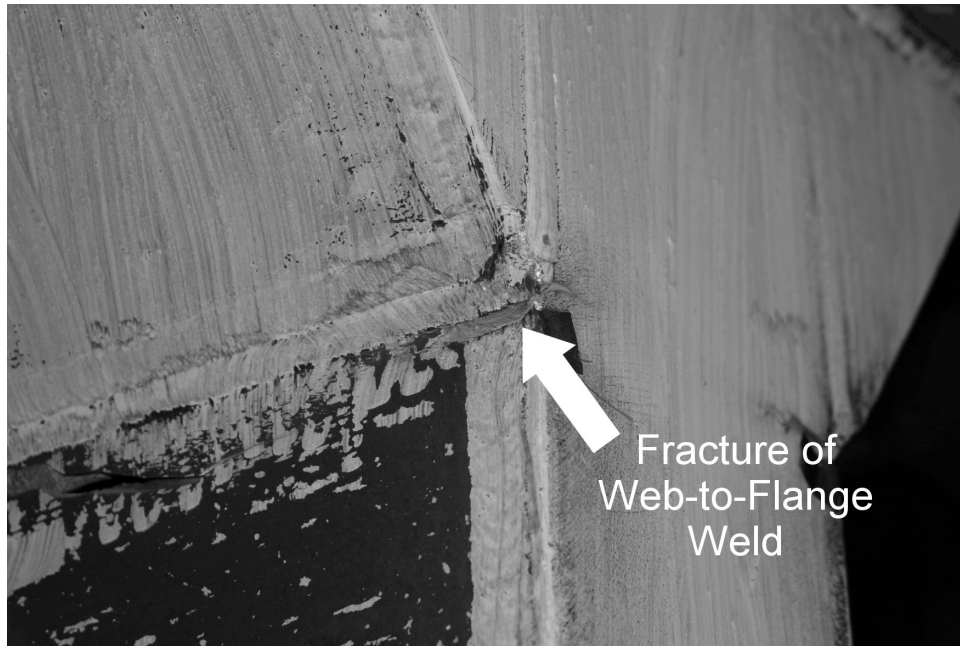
Fracture of Top East Flange Beginning in the Web-to-Flange Weld of Specimen X1L3.0
